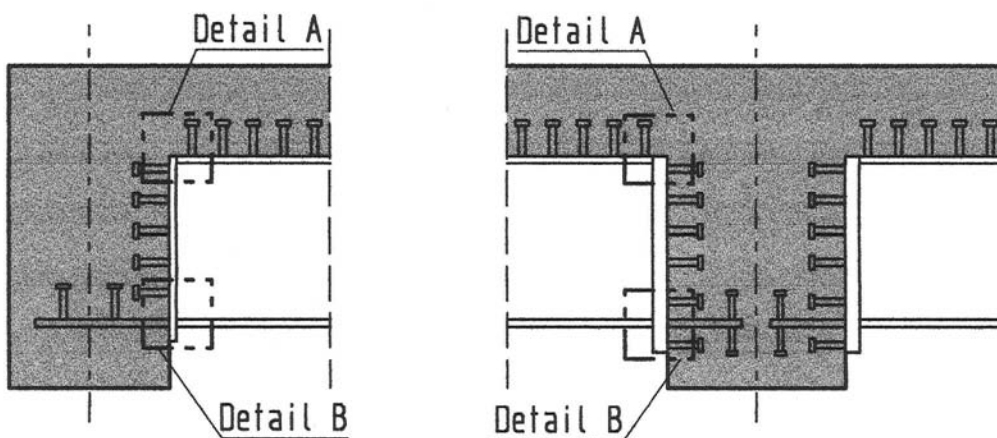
Concrete cross girder with thick cap plates and tension anchoring
